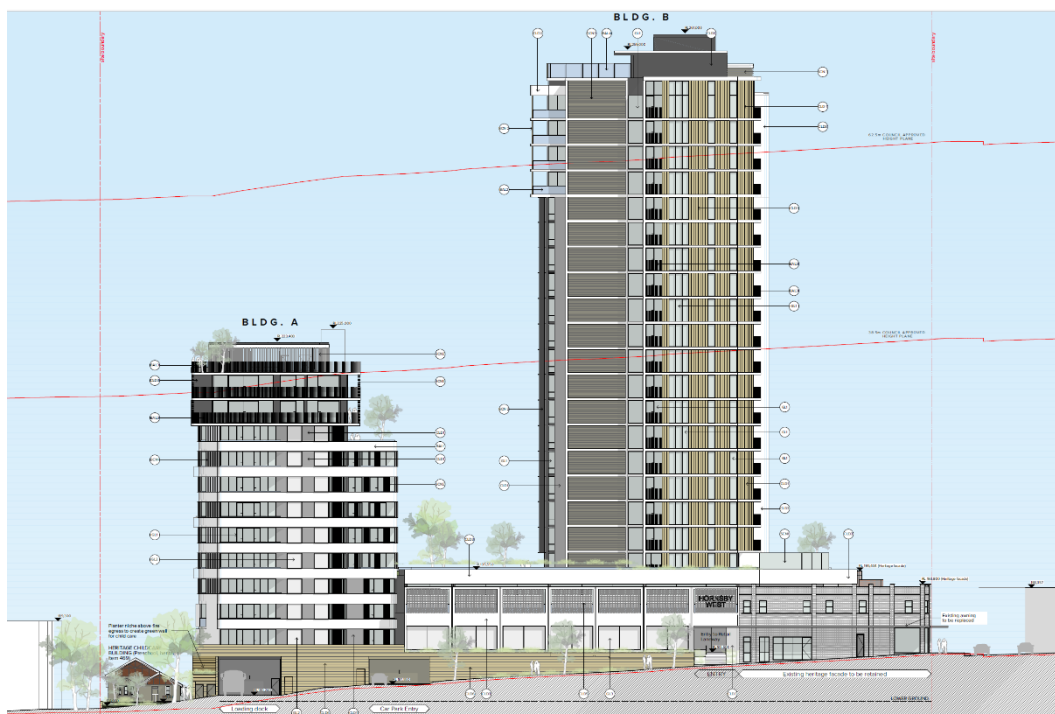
Extract of South Elevation (Dural Street) (Source: Turner Architects)
